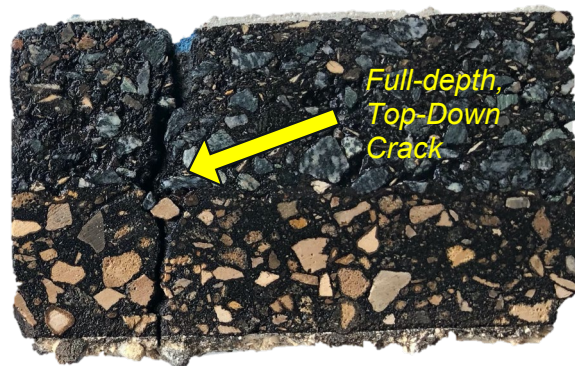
SR 20 MP 2.973 Control Section Paving Lane Joint Cross-Section Showing Top-Down Crack
